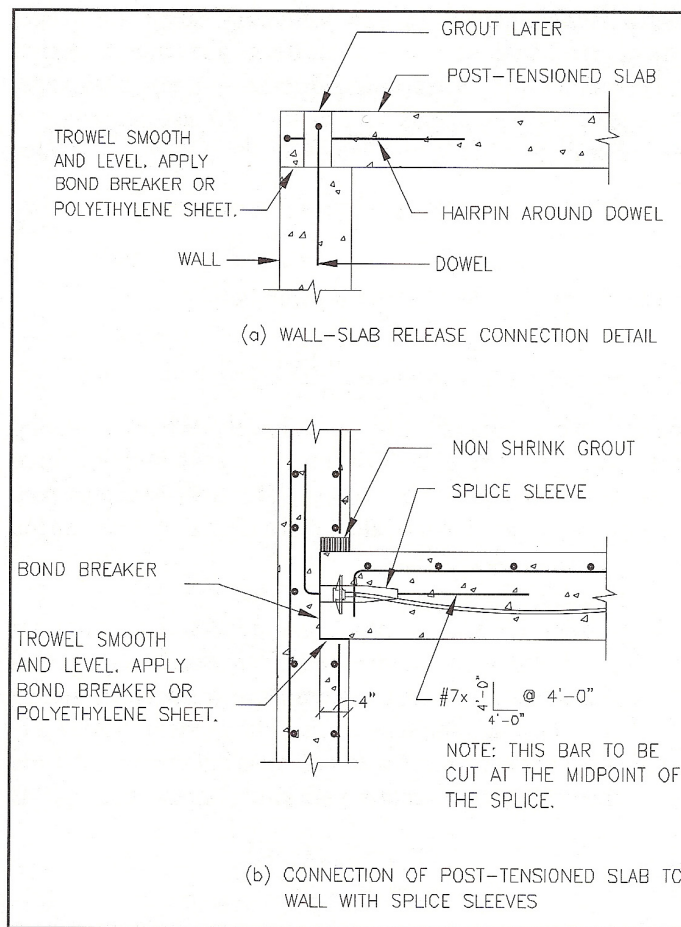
(Typical Slip Joint Details at Wall/Slab Intersection)
